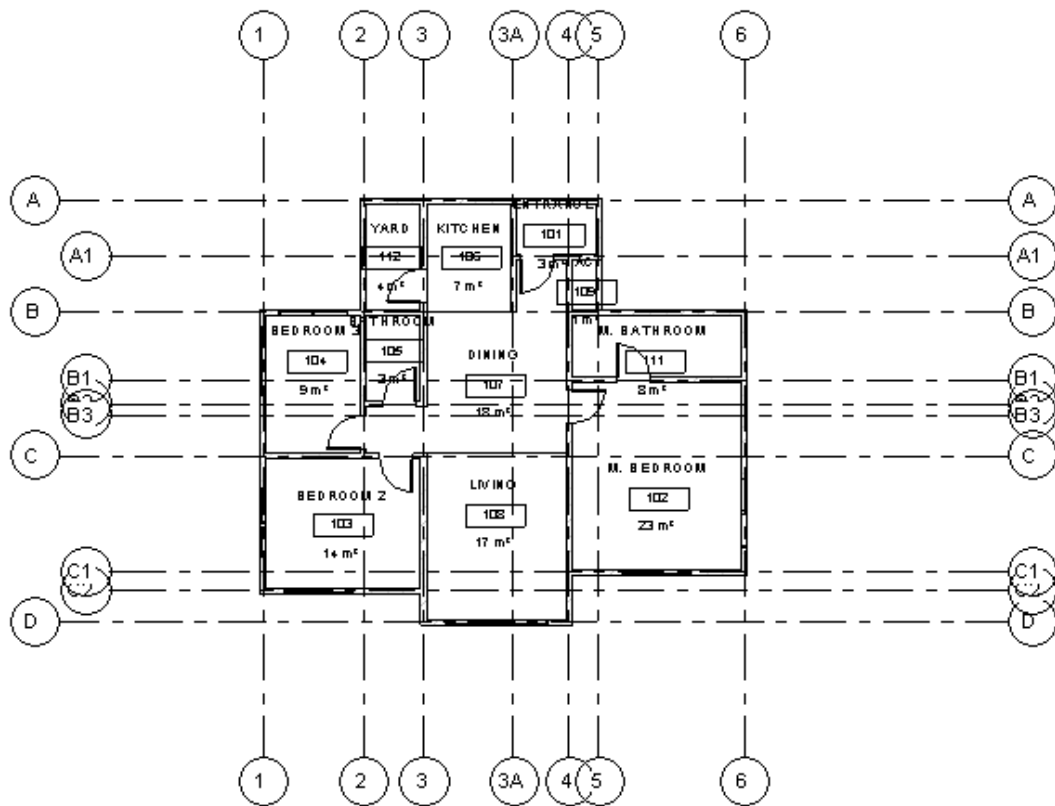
GROUND FLOOR PLAN OF SINGLE STORY HOUSE
